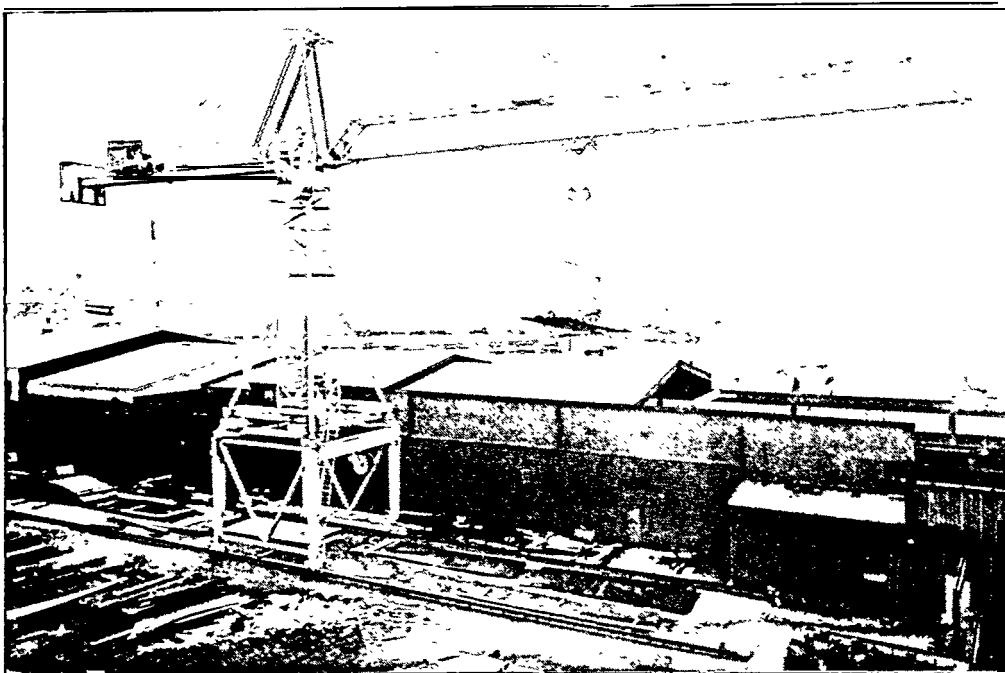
Traveling foundations on a portal and on a plateau undercarriage. Cylindrical pipe towers are often used for permanent installation.
